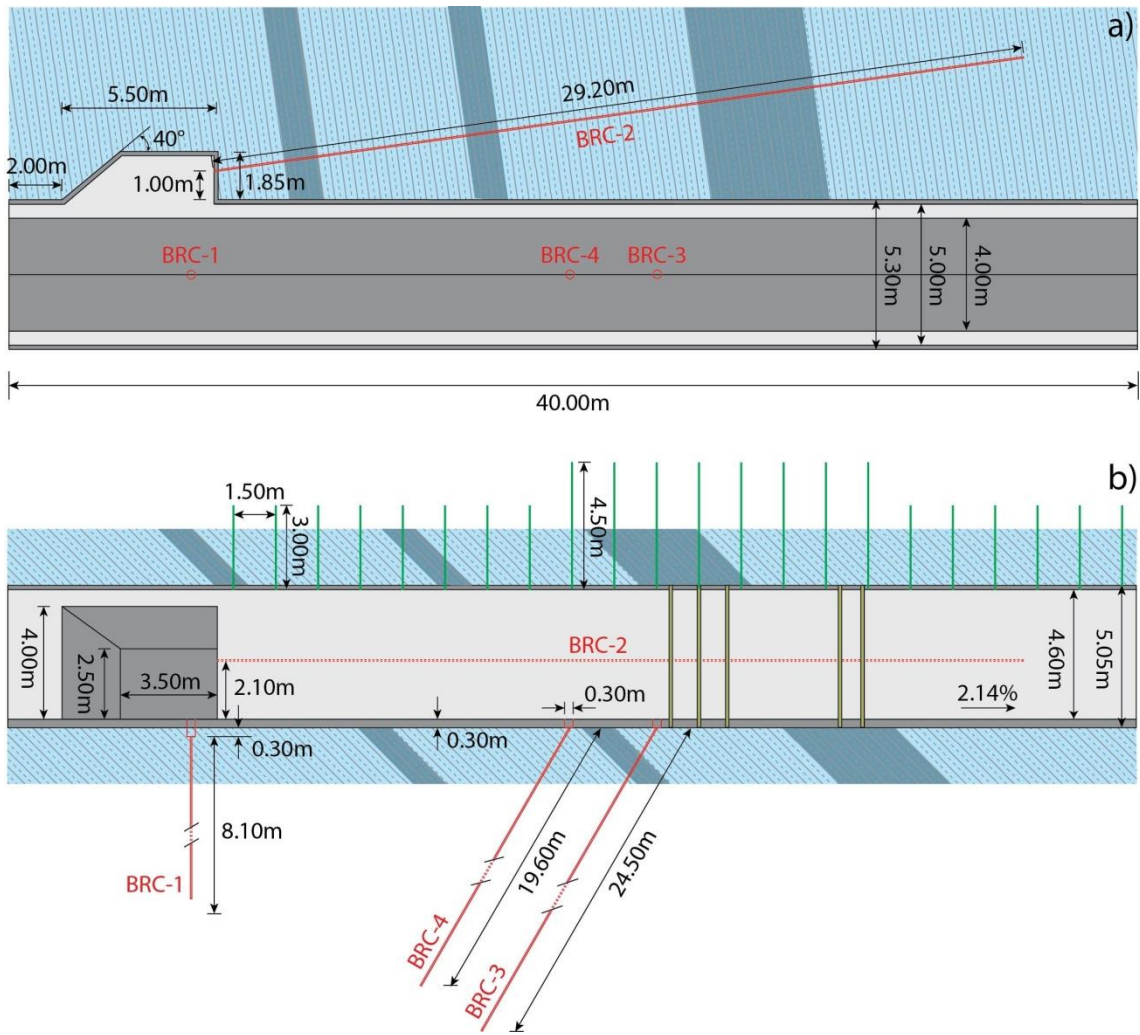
Longitudinal a) plan and b) cross-section view of the mine-by section showing the tunnel geometry and the final support measures.
